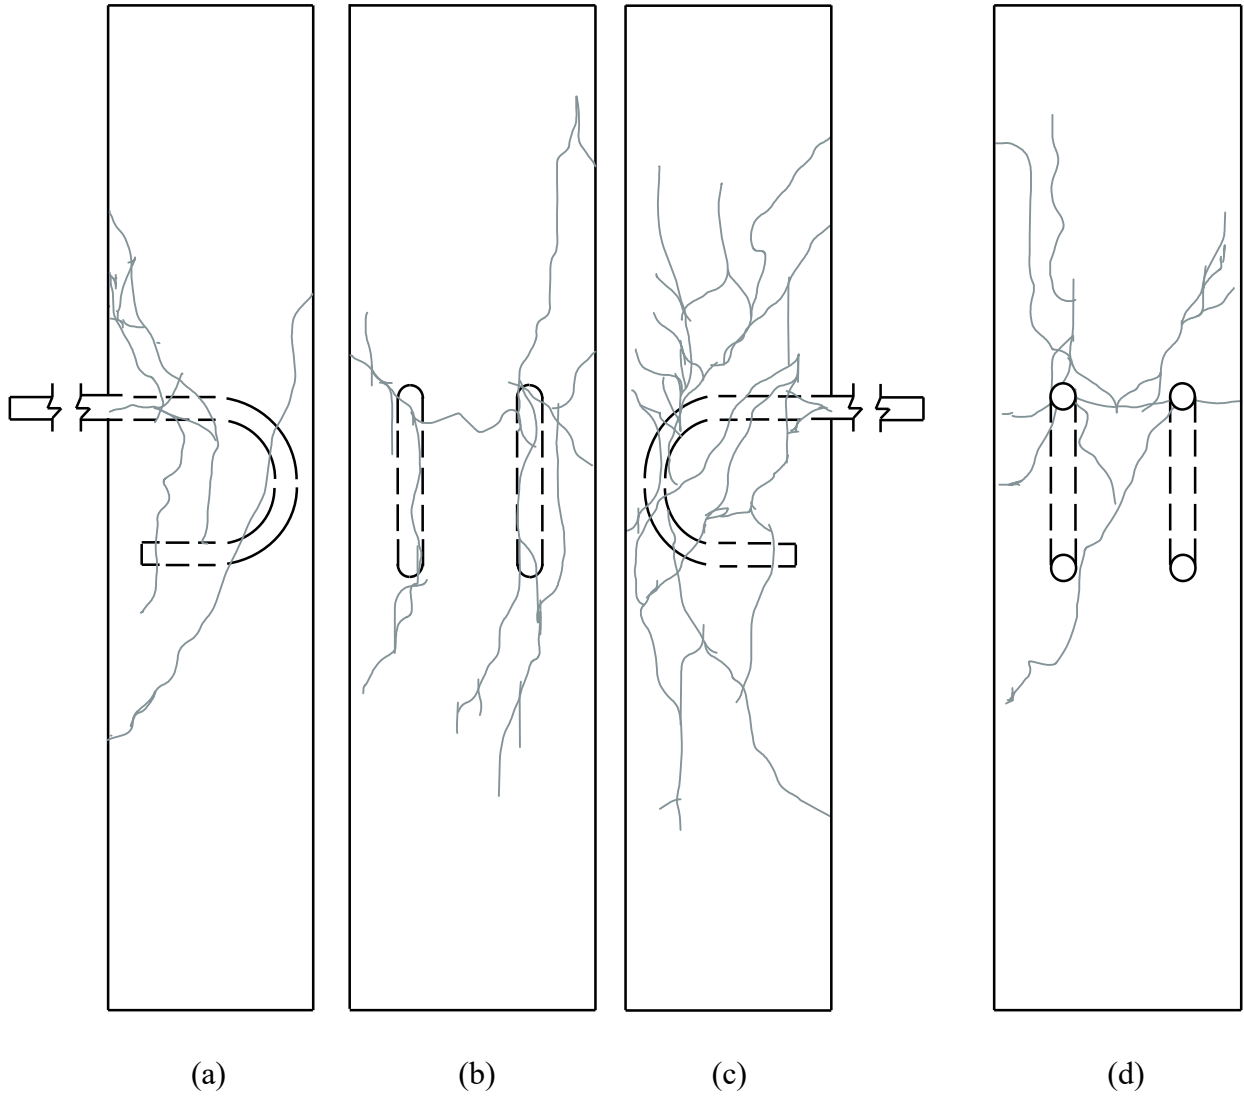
Crack pattern at maximum normalized tensile load for beam-column joint specimen P1-180: (a) west side face, (b) back face, (c) east side face, and (d) front face
